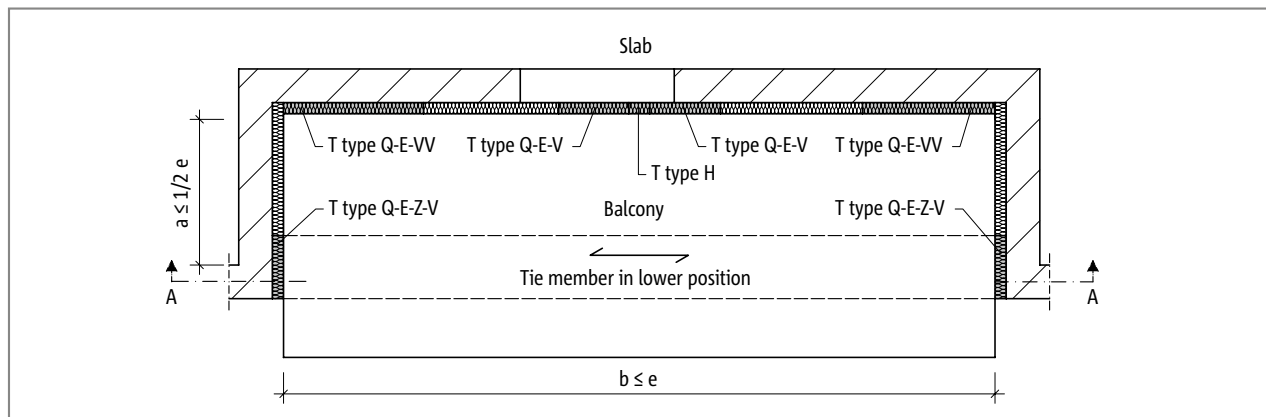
Schöck Isokorb® T type Q-E-Z-V: Layout of recessed balcony - symmetrical
